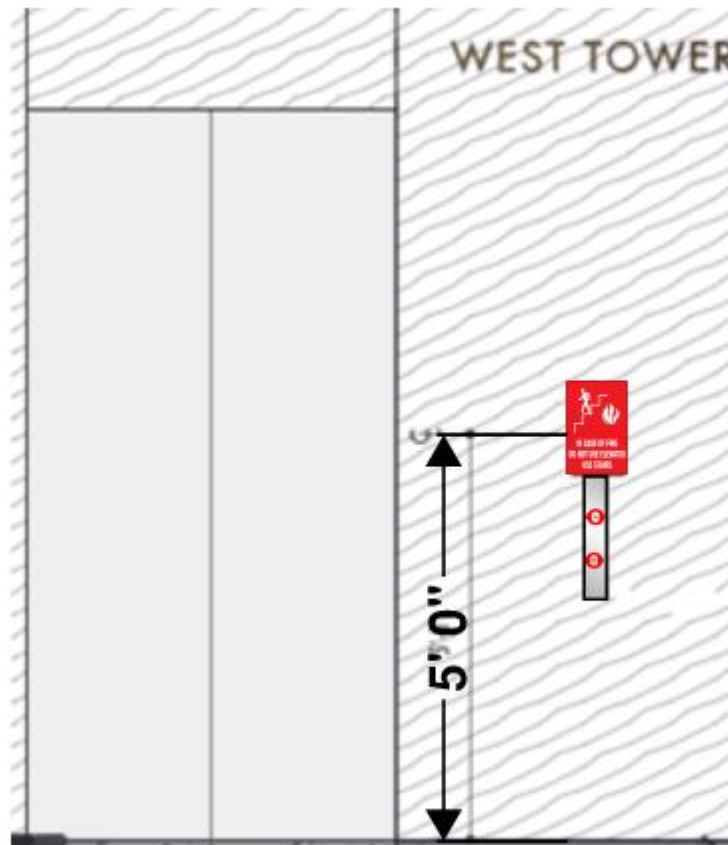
Example of Sign placed above the Elevator Controls 5 feet above the ground
